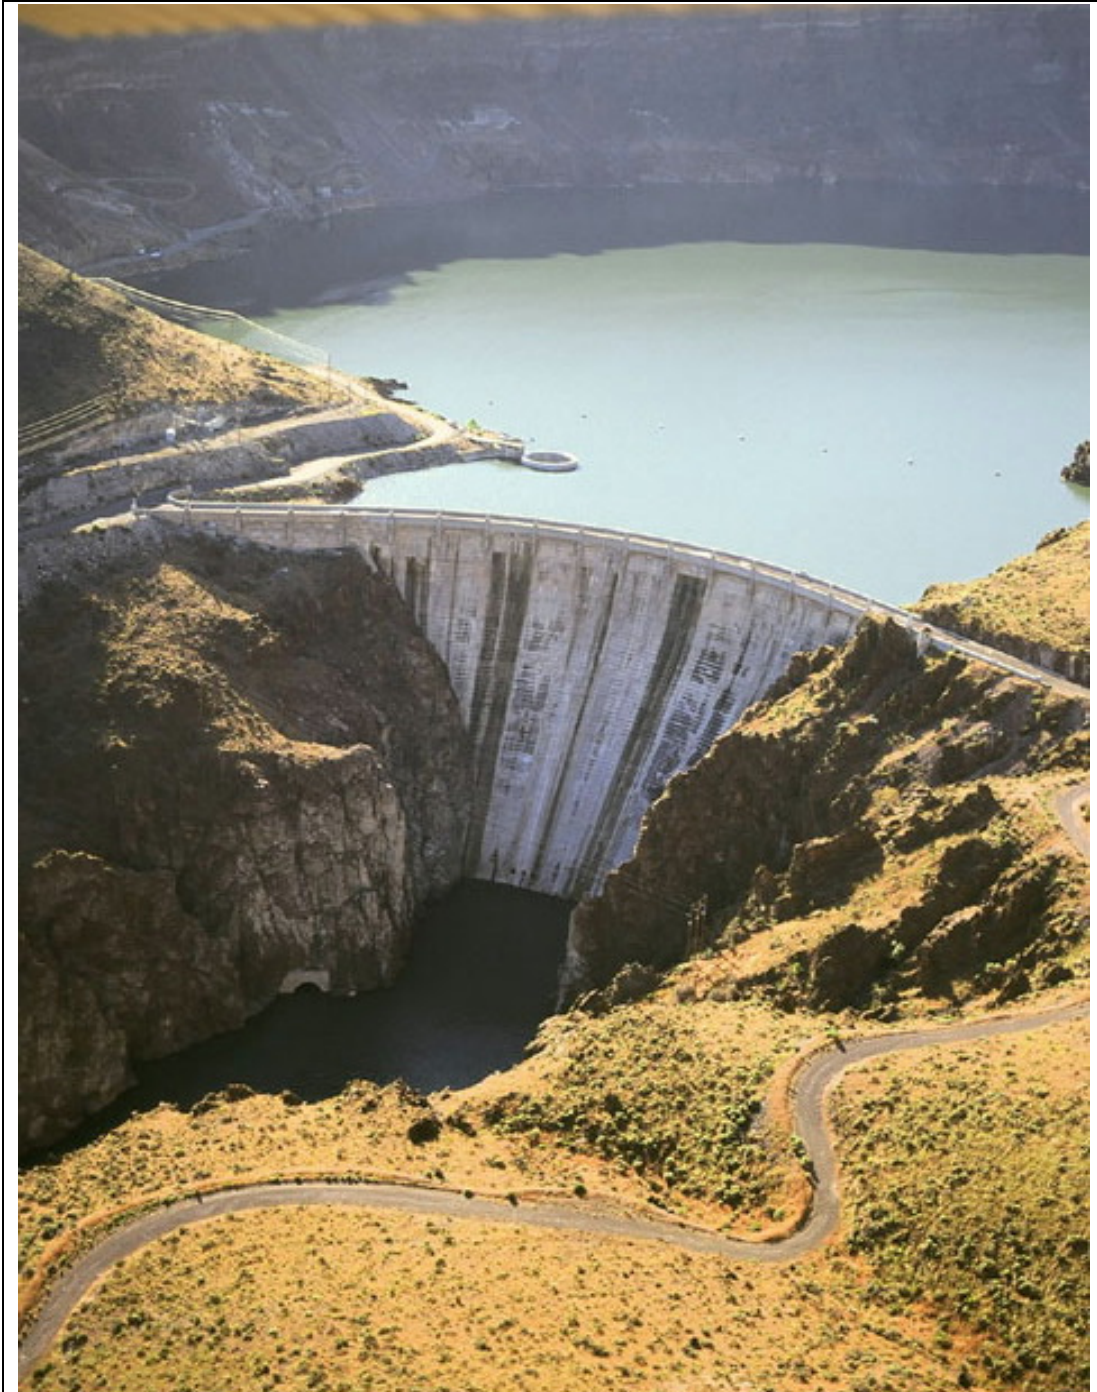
Aerial view of Owyhee Dam. (Reclamation photo by Dave Walsh, June 22, 2005.)
